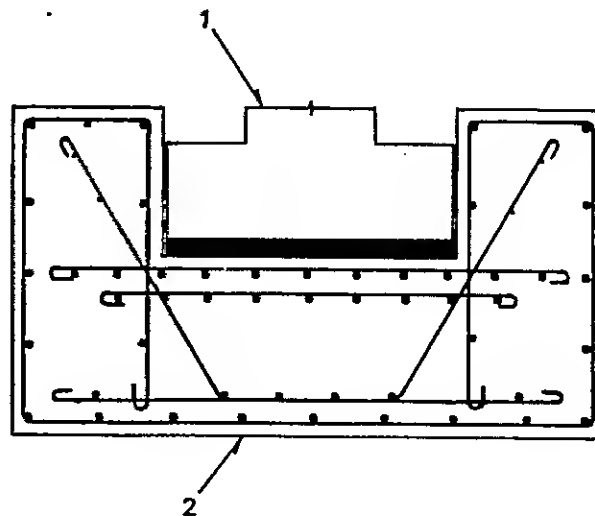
Typical Reinforcement in a Hammer Foundation—(1) Anvil Block, (2) R. C. Foundation.
